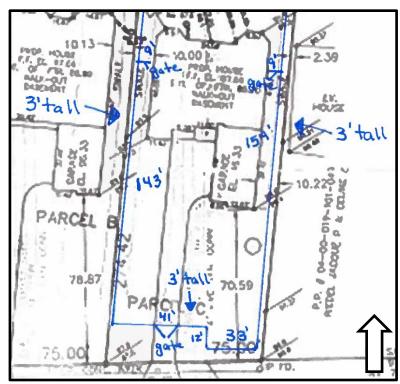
Applicant Provided Plan – Building Permit BPF 24-2 (Under Review)
